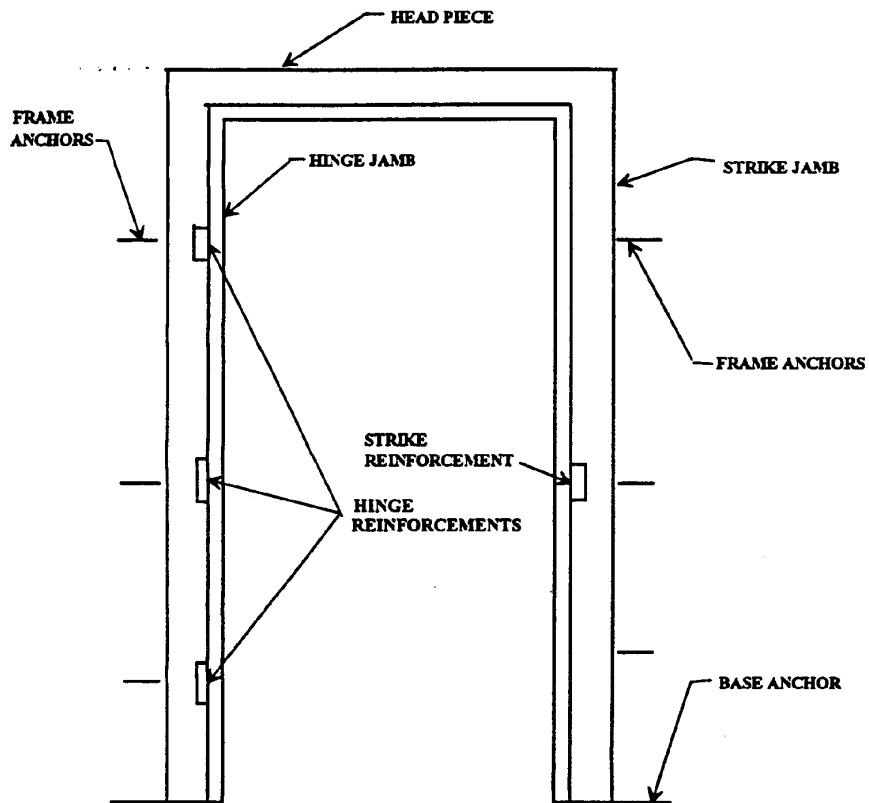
Single - Unit Type Pressed-Steel Frame
